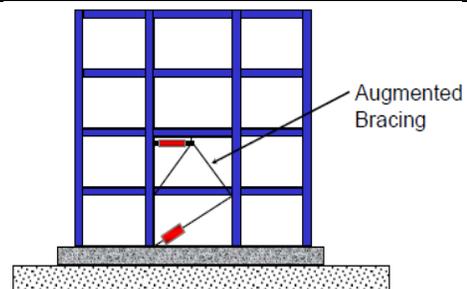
DAMPER PLACEMENT WITHIN BUILDING
